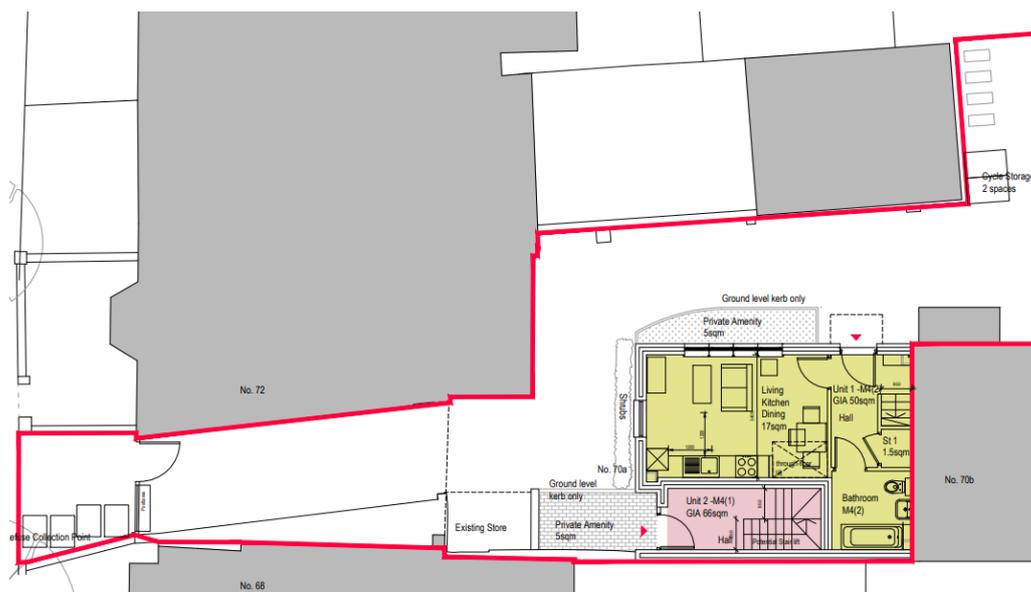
Proposed Ground Floor Plan with Cycle Parking & Refuse Areas
